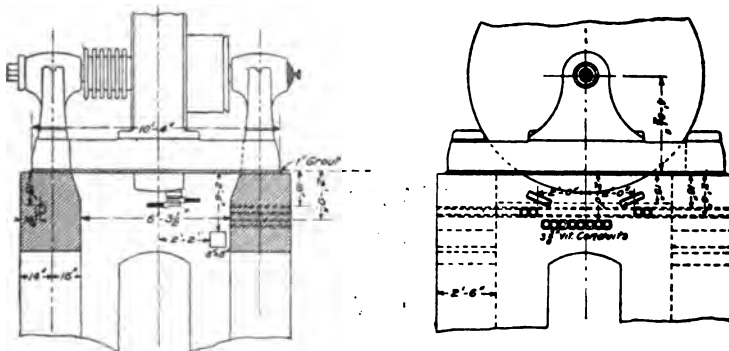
Concrete Foundation with Ducts Installed for a Converter.
